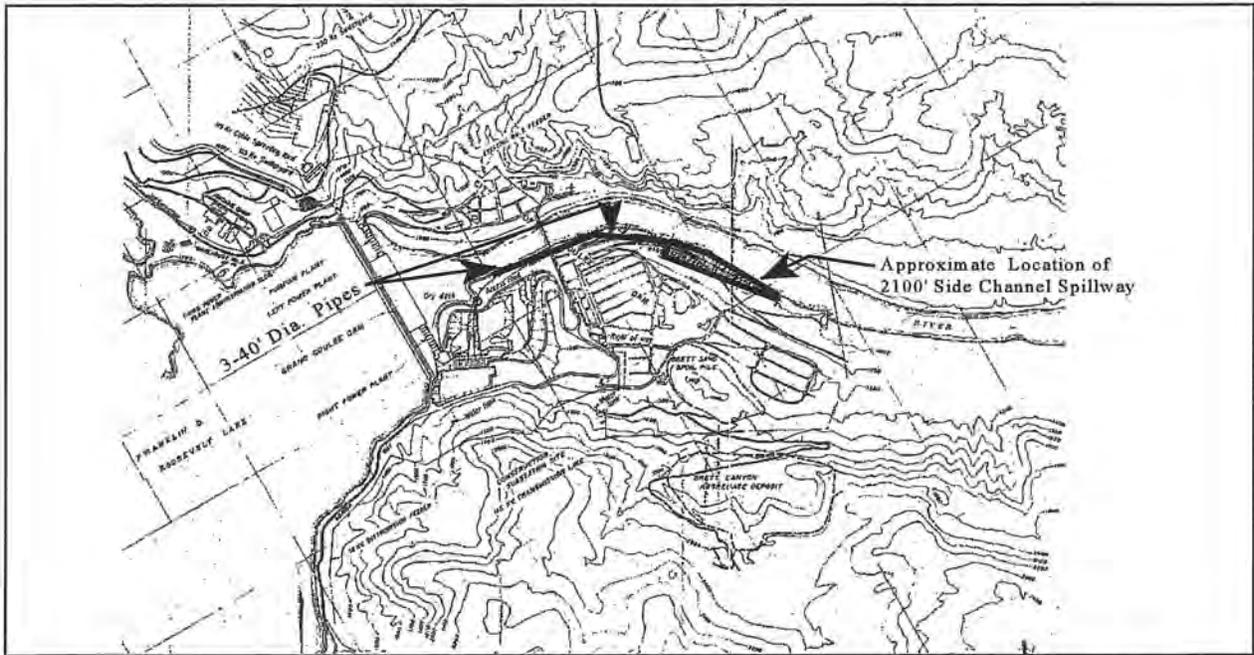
Plan view of the proposed location for the side channel basin and penstocks for alternative No. 8. (fn:alter#8-2.wpg)
